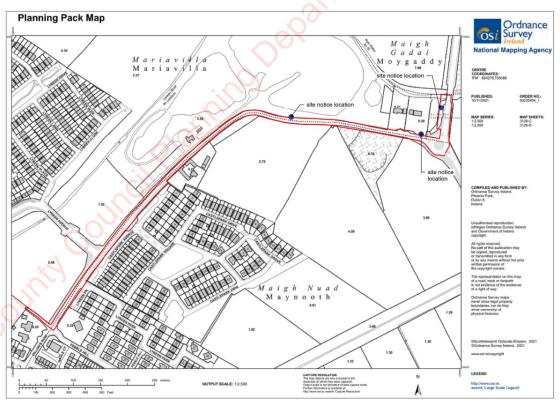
Site Location Plan – Kildare Bridge Works. Source: Crawford Architecture
